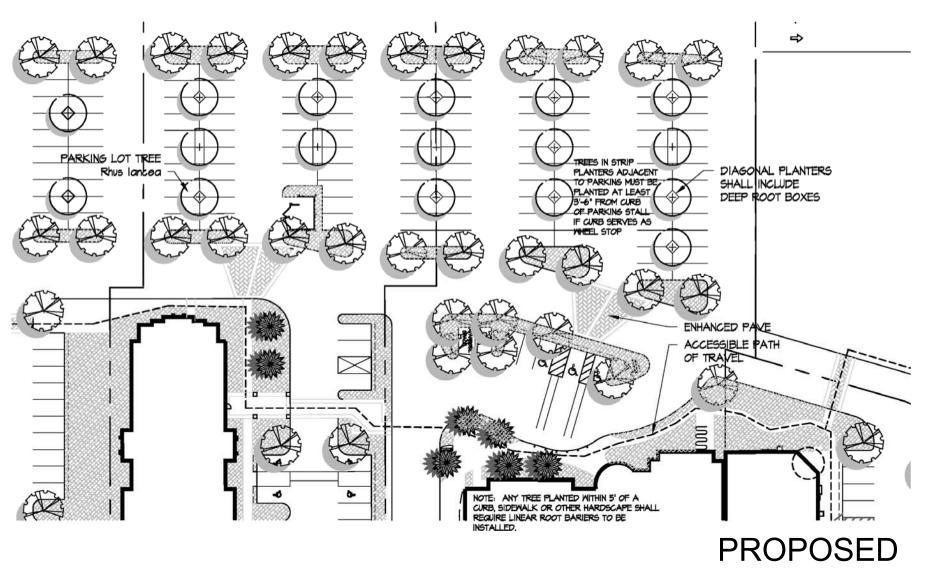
A BUILDING ENTRY LANDSCAPE/HARDSCAPE CONCEPT
